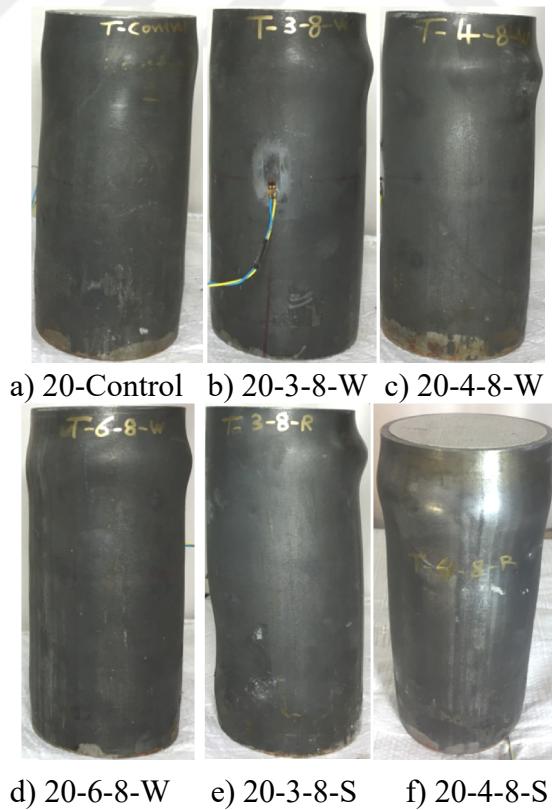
Failure mode of 5.63 thickness steel tubes with $\phi 8$ mm reinforcing bars specimens
